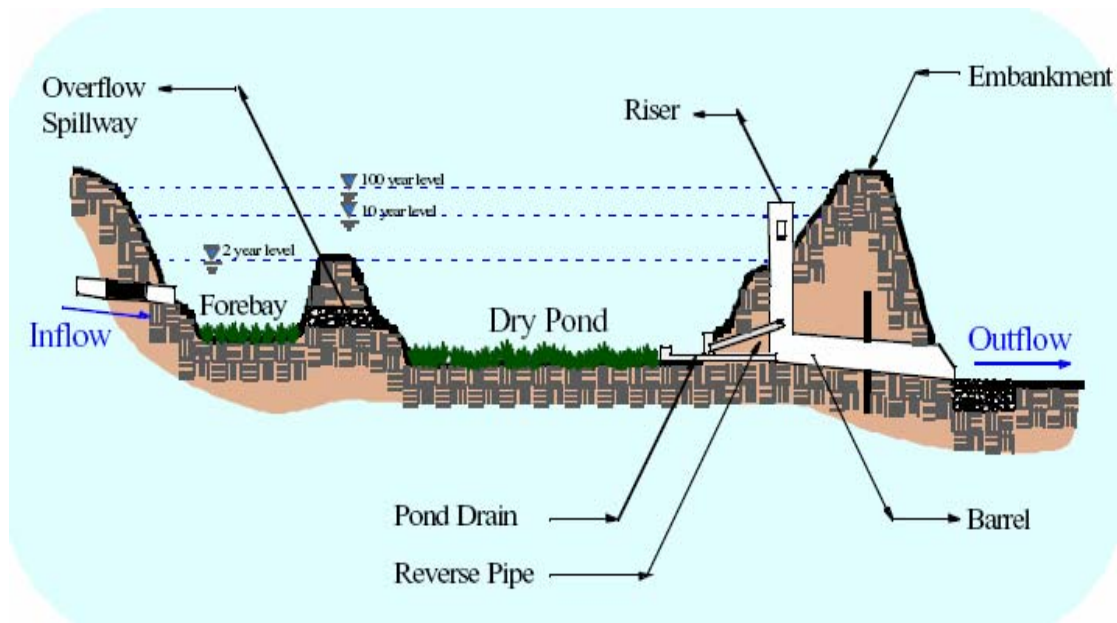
Dry extended detention ponds (Harlow et al., 2000).
